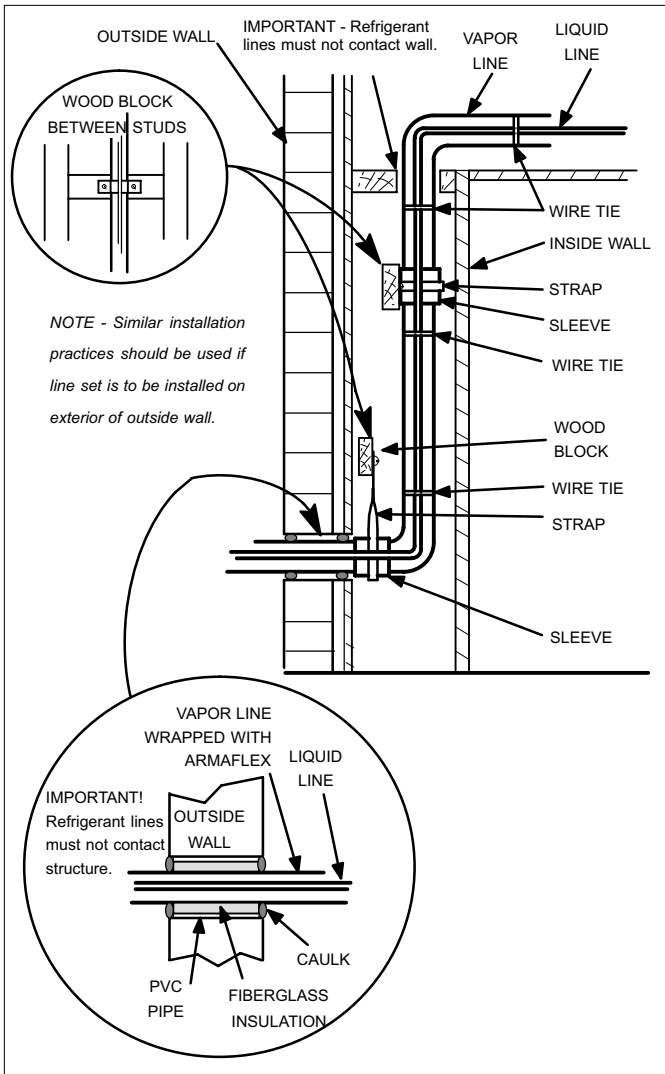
Refrigerant Line Sets: Installing Vertical Runs (New Construction Shown)
